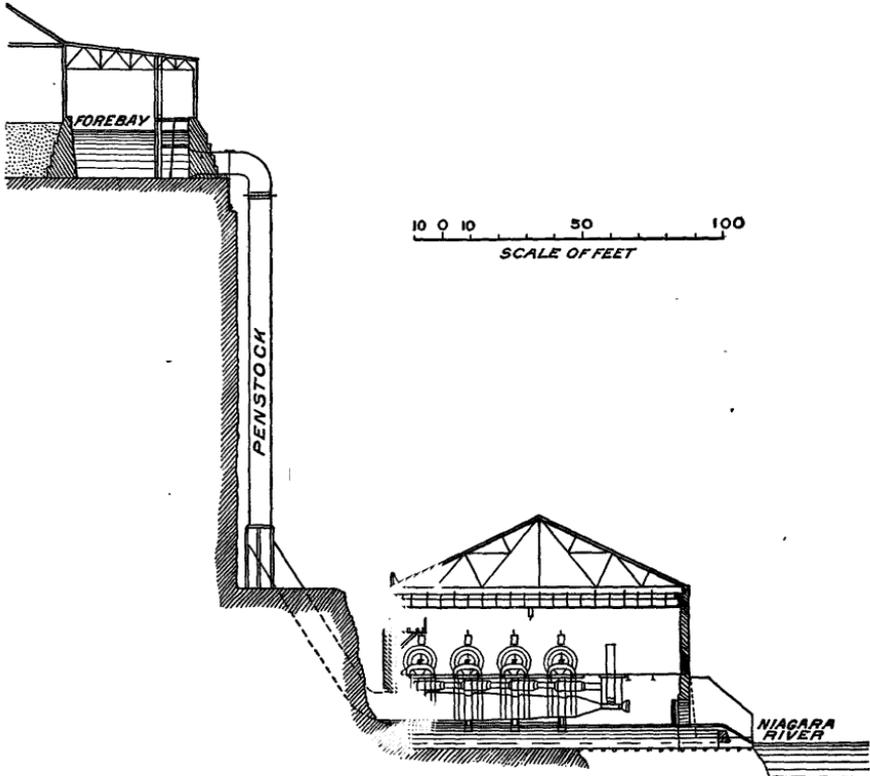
General plan of development of the Niagara Falls Hydraulic Power and Manufacturing Company.
